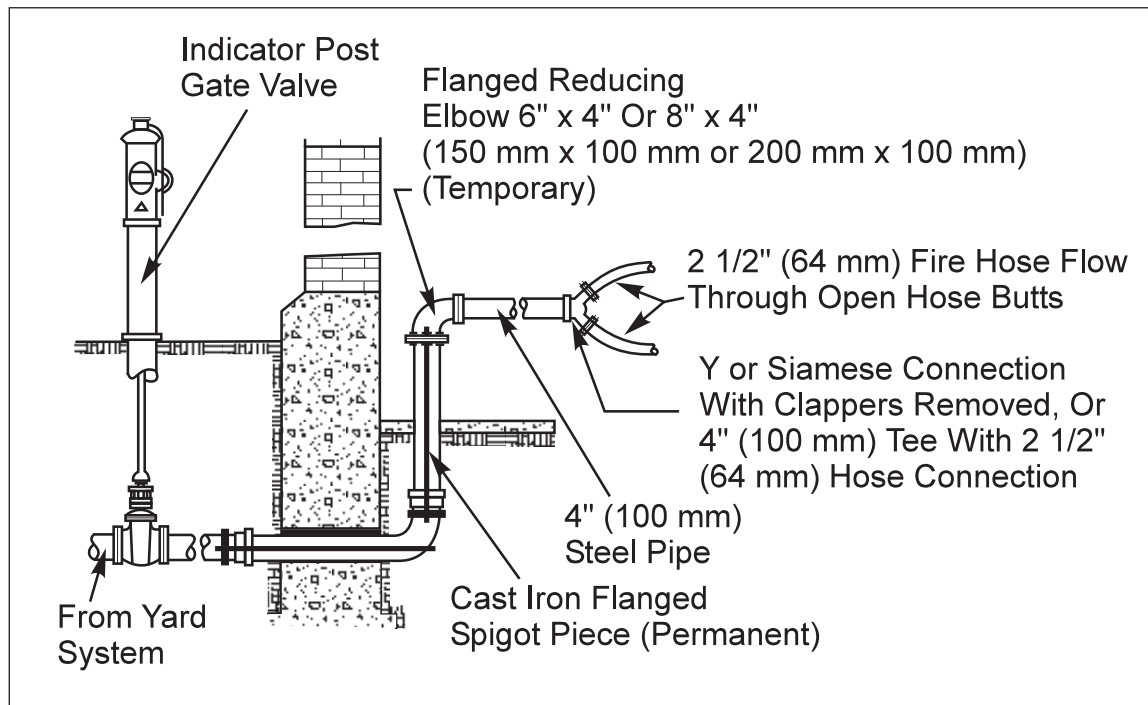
Arrangement for flushing of sprinkler riser underground lead-in piping (New Installation).
